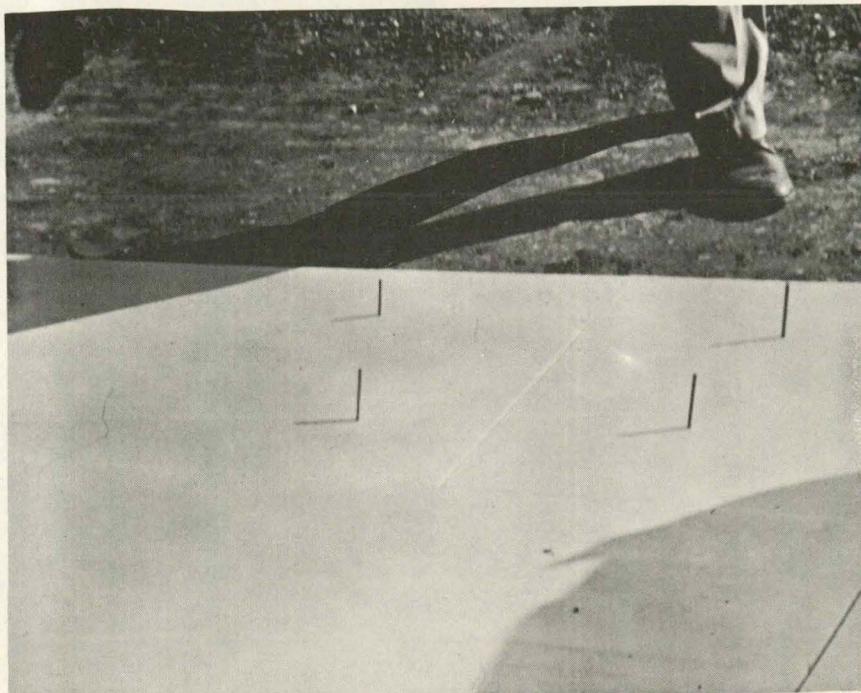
Wooden pegs used to fasten the Styrofoam to the Subgrade.
